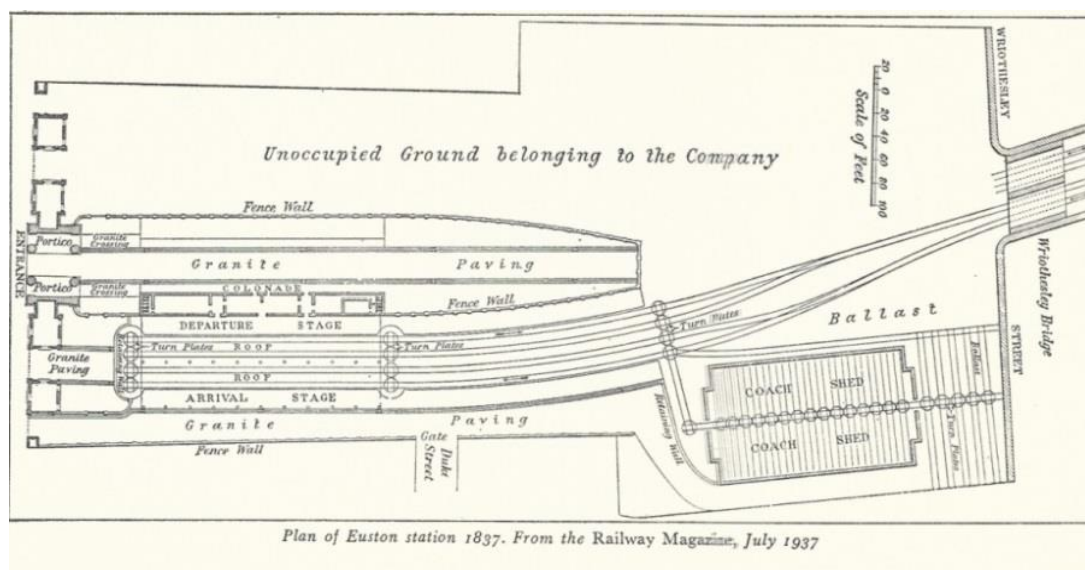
Euston Station General plan (Source: Jackson, 1969)
